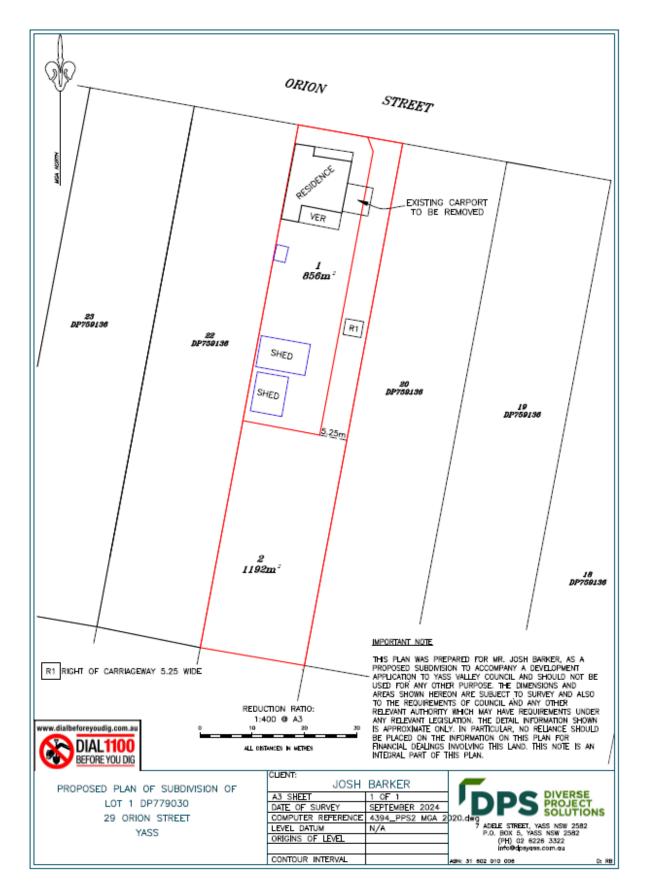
Proposed Plan of Subdivision (Source: DPS YASS P/L, September 2024)
